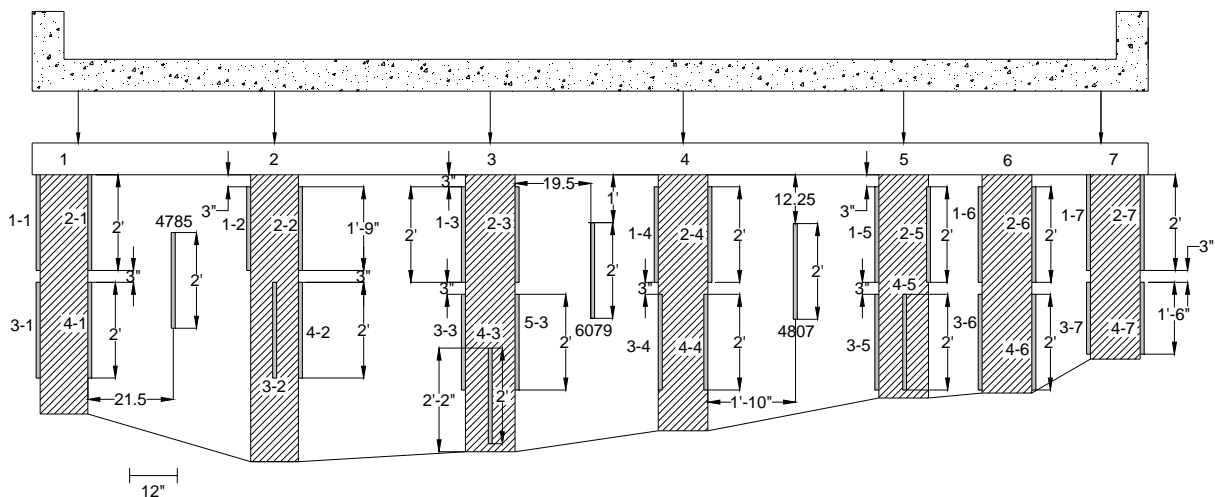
Construction of the new bridge foundation (Bridge No. 243470 Marshall County – August 19 2005)
